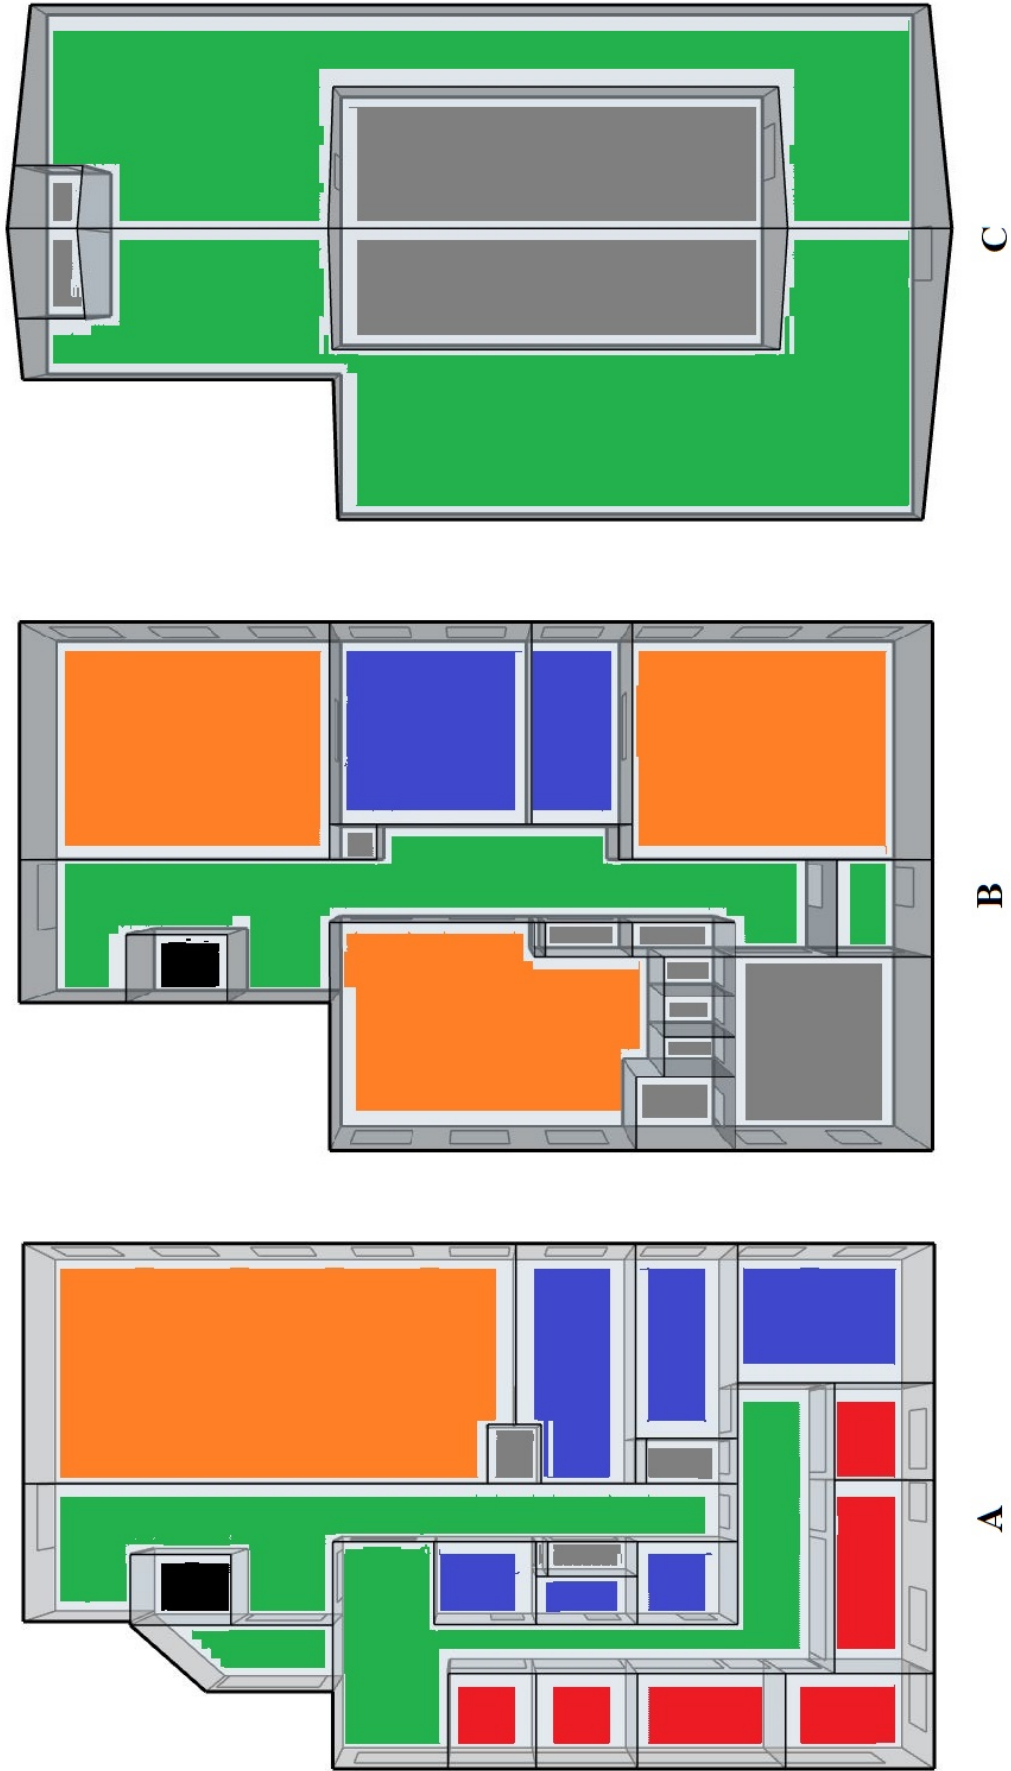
Floor plans with zones: A) Ground floor, B) second and third floor, C) Loft
